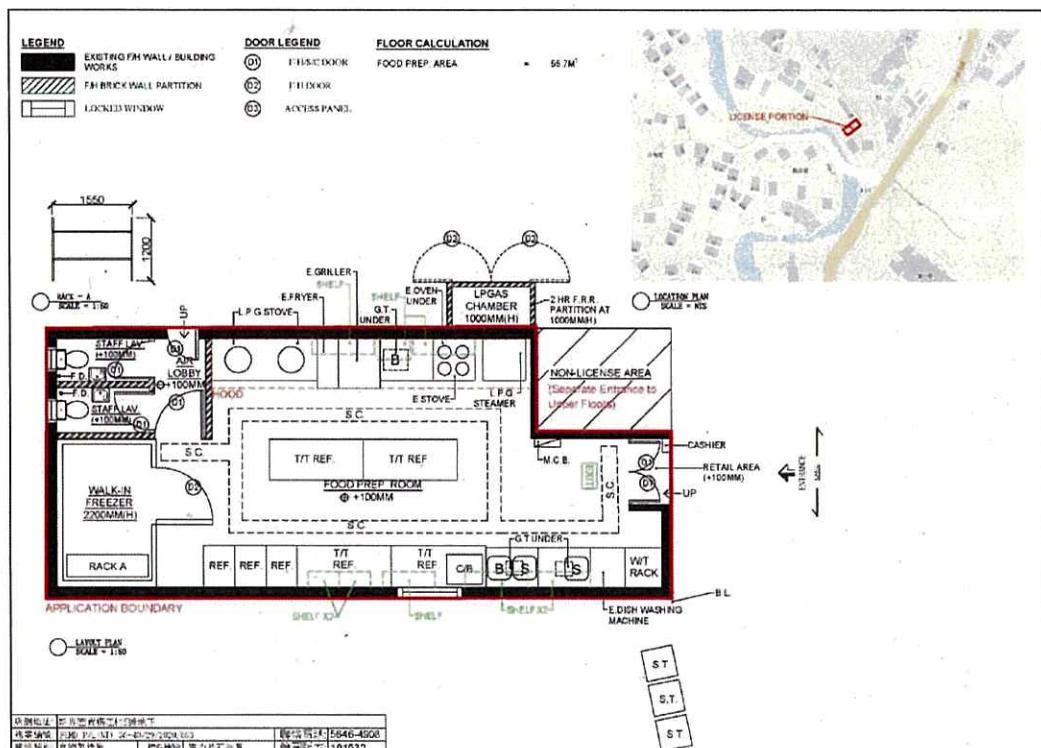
Layout of Fast Food shop within the Subject Premises
